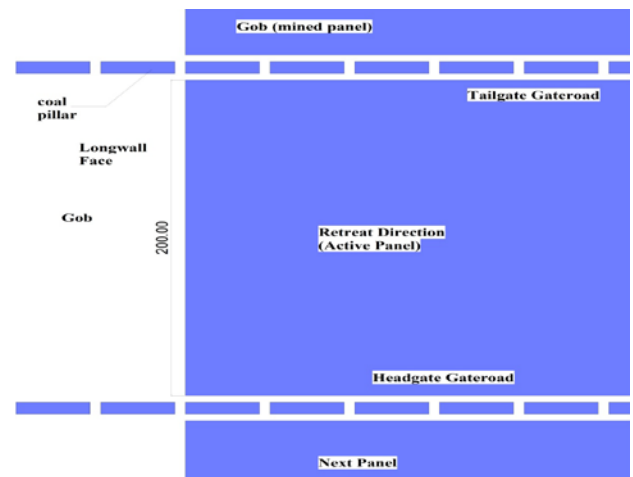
3D PLAN SHOWING THE LAYOUT OF THE PANEL AND COAL PILLAR
